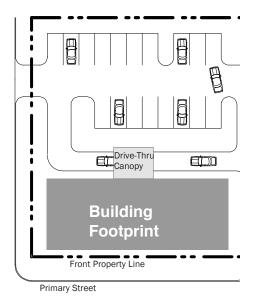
(8). Recommended Drive-Through Facility Layout.
